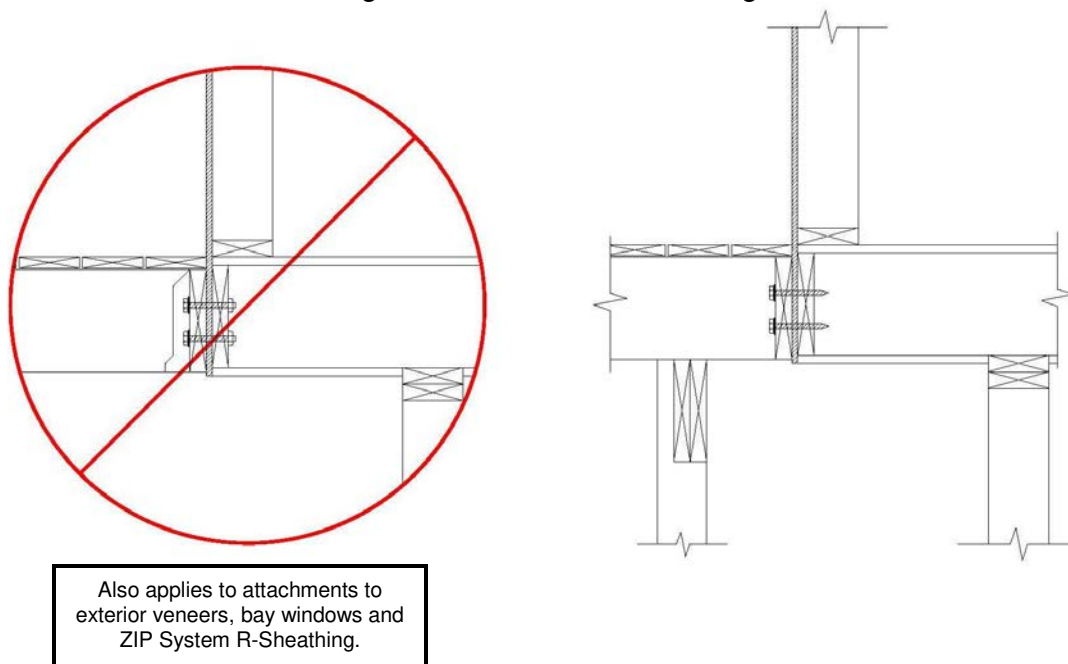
Free-standing Deck Construction for Cantilevered Walls and Overhangs
